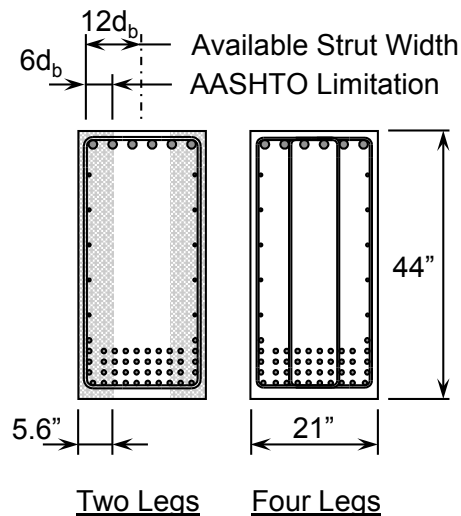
Effective width of strut anchored by reinforcement at the CCT node.
